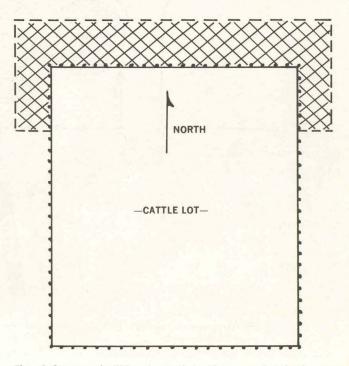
Storage facilities located in the cross-hatched area will not cause sun shading problems during winter.
